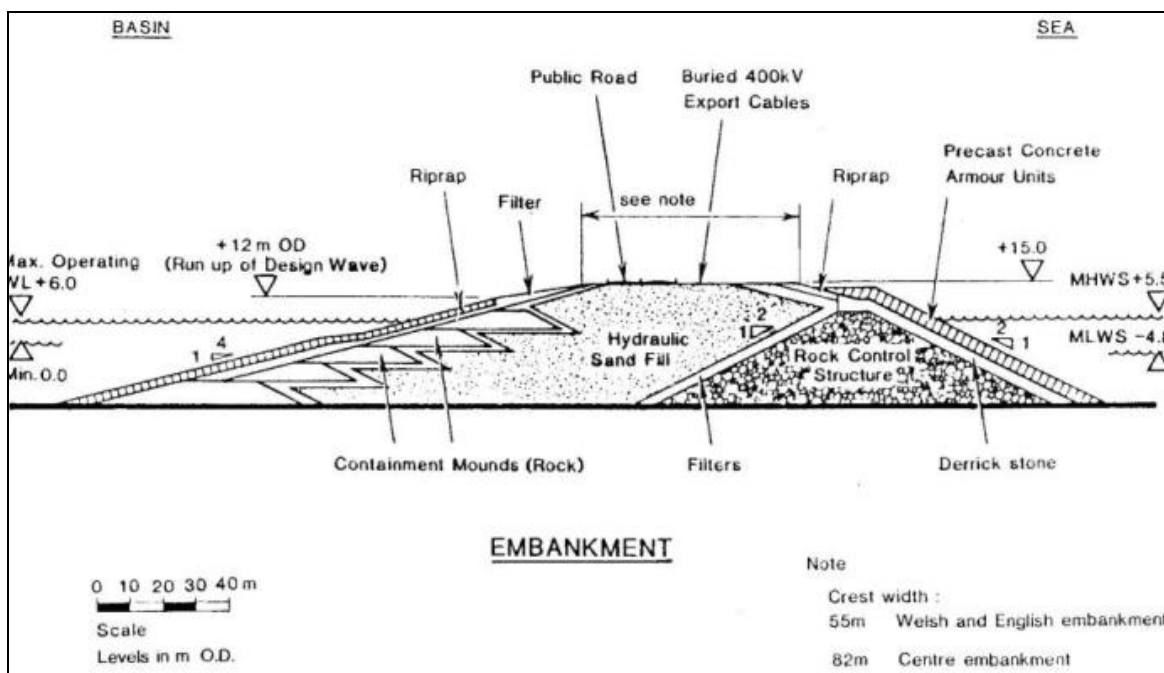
(10): Section of embankment for Cardiff-Weston barrage
